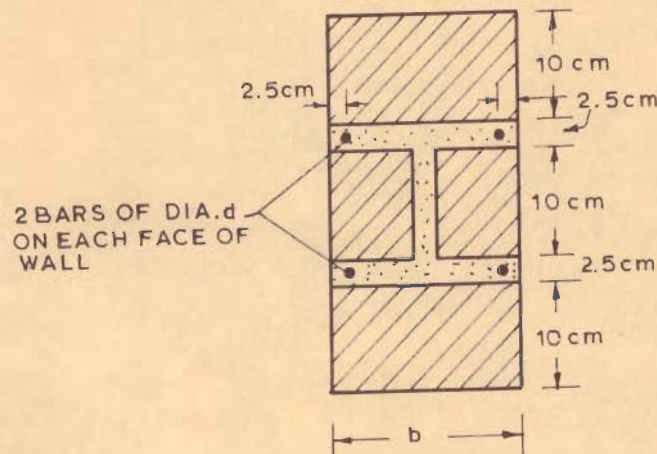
STRENGTHENING OF MASONRY AROUND OPENINGS
